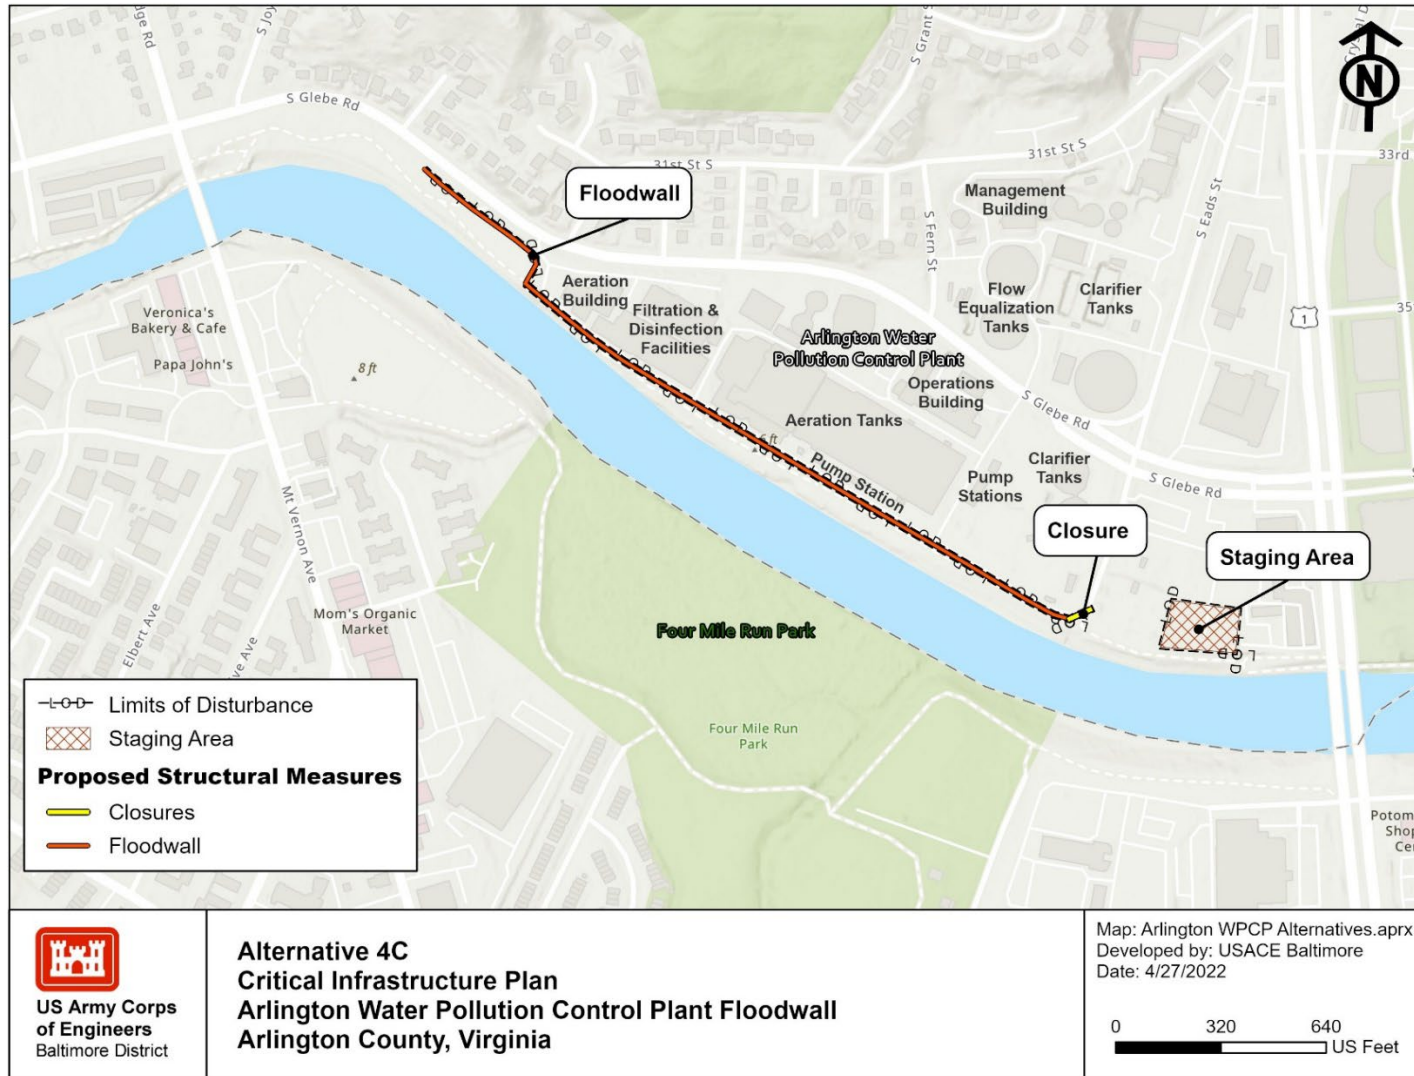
Alternative 4C - Arlington Water Pollution Control Plant
